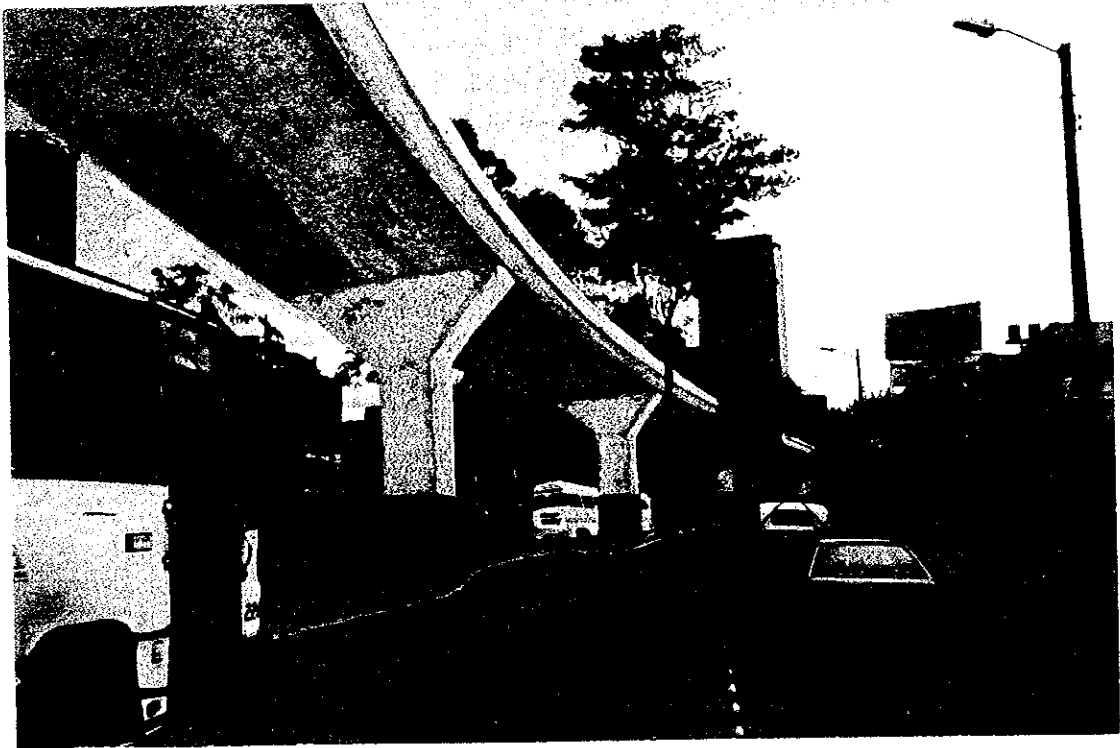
Image Plan of Viaduct For Trunk Busway on Avenida Caracas
